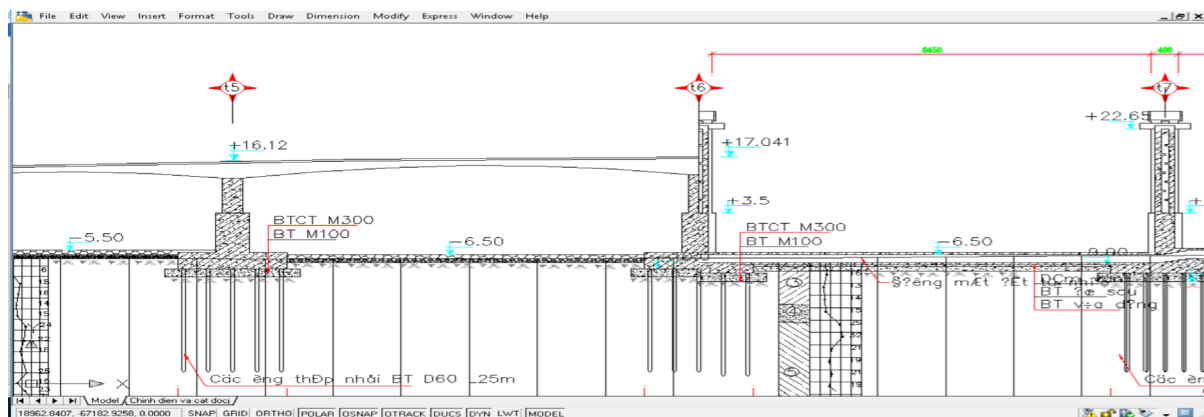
A longitudinal section of the bridge on Cai Lon sluice gate
